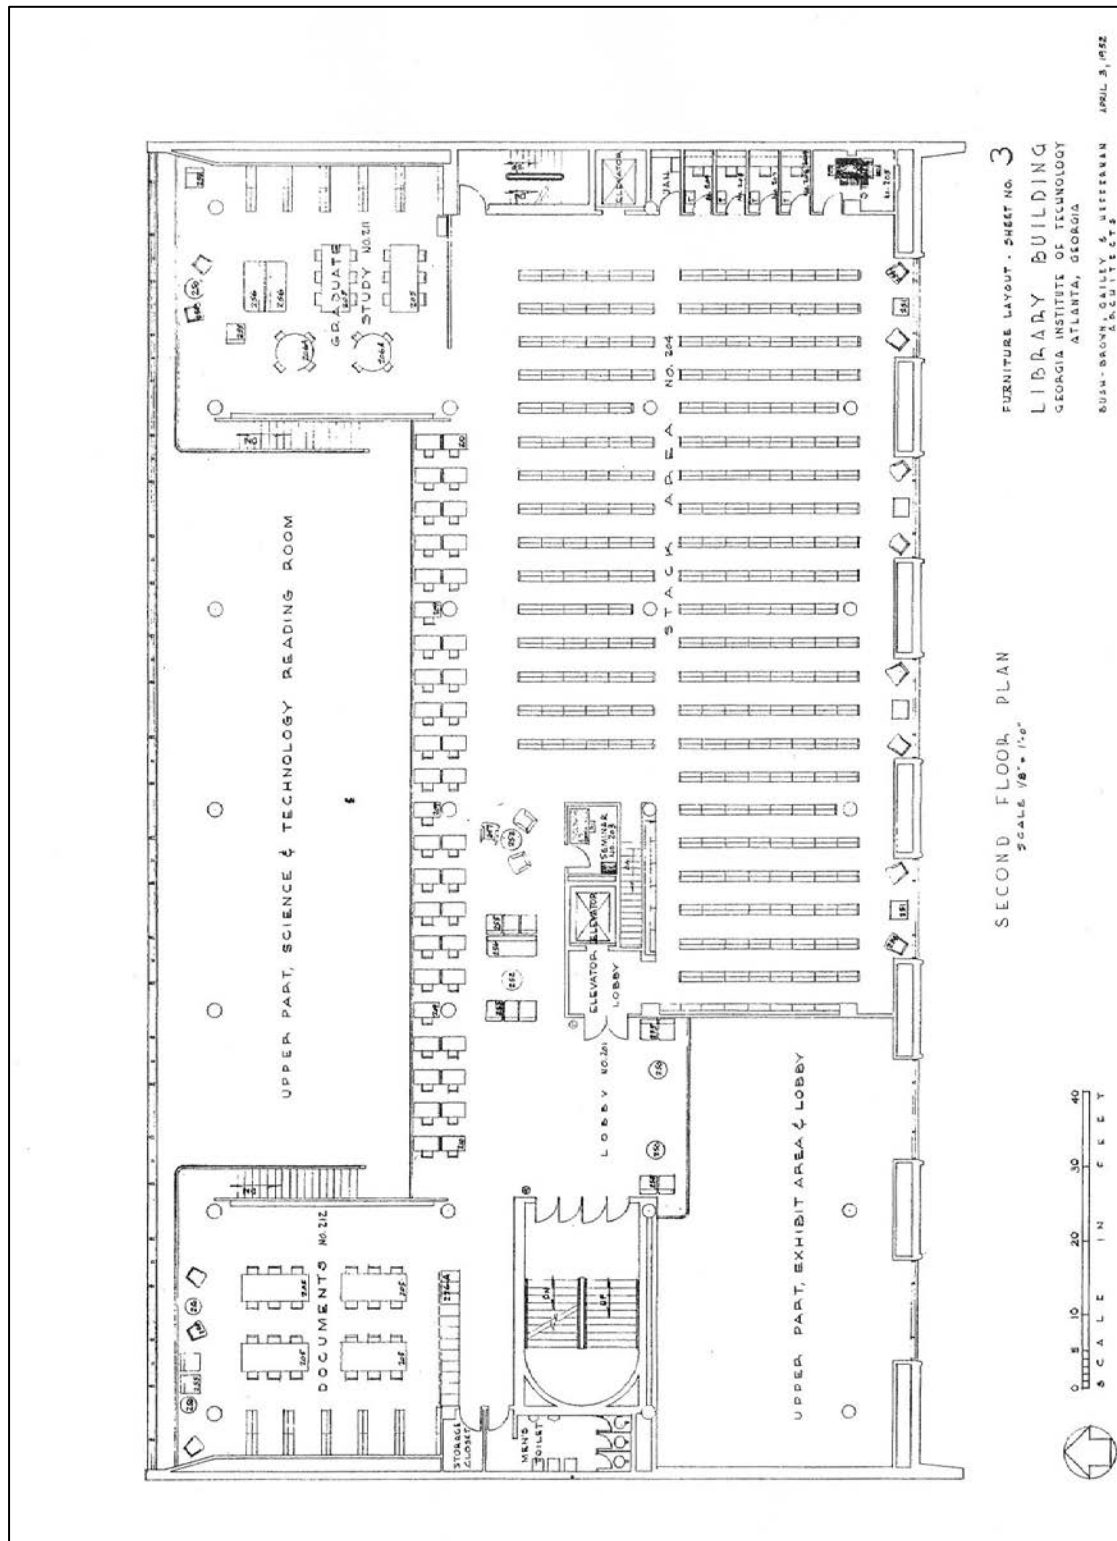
Original second floor plan and furniture layout; Dedication Brochure *Georgia Tech Archives*. UA415A, Series 3: Subject Files: Buildings and Grounds, ca. 1900-ca. 2011, Box VF35, Folder 24.
